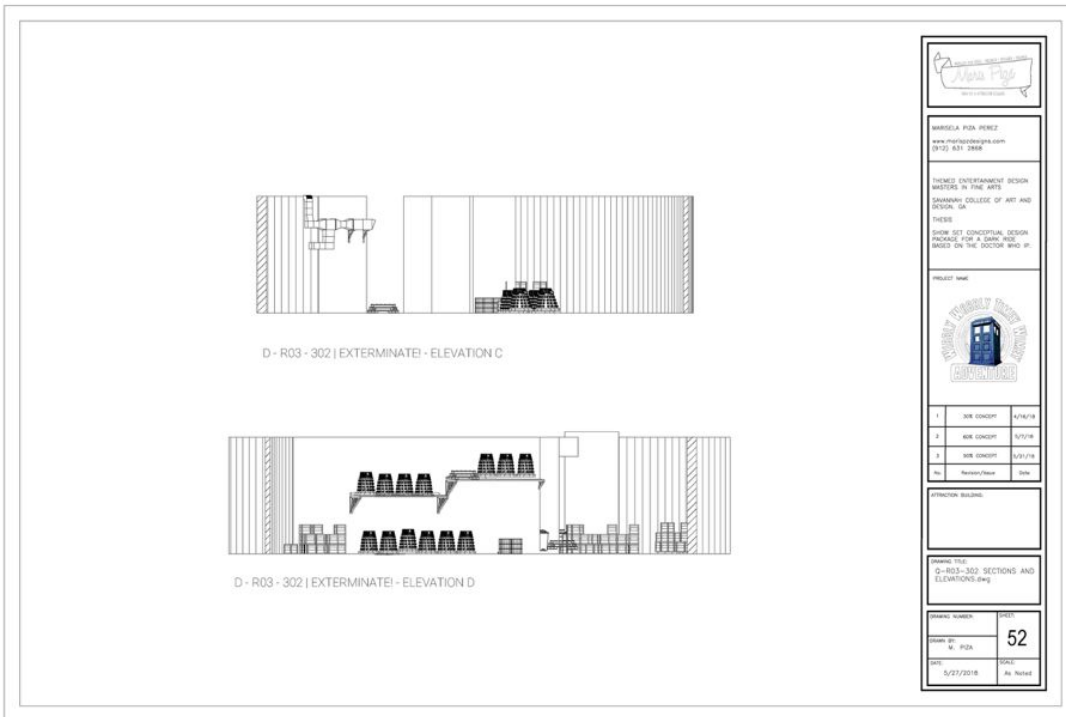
D-R03-302 | Exterminate! - Sections and Elevations
